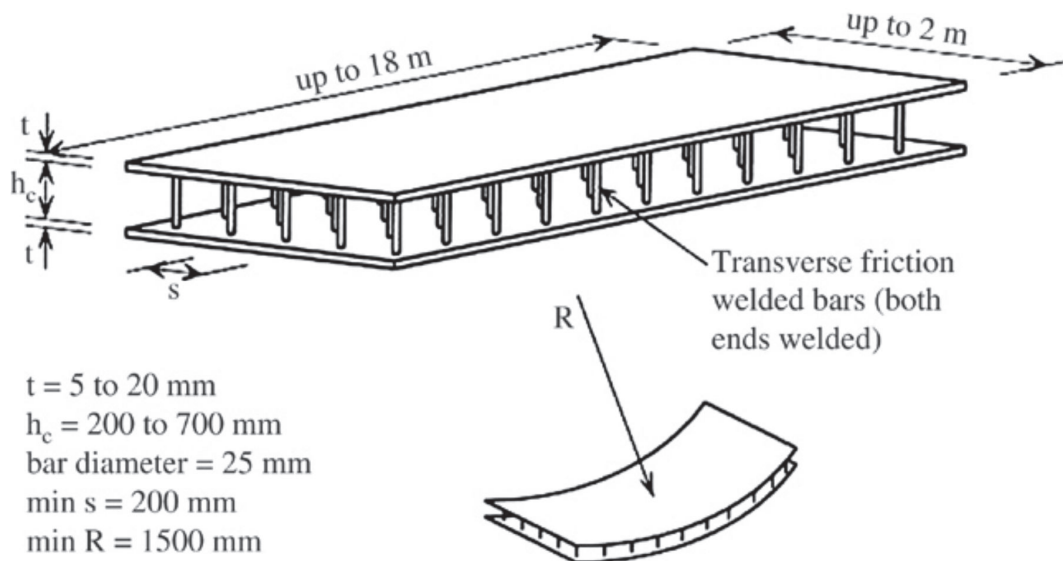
Bi-Steel Sandwich Construction (Foundoukos et al., 2007)
